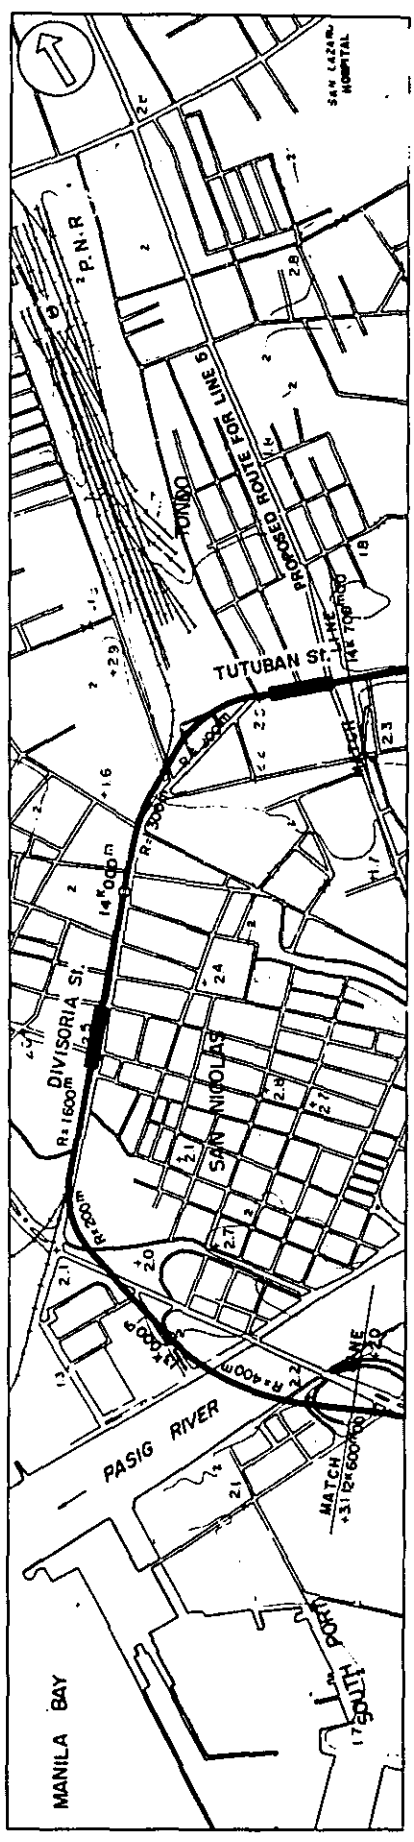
Plan and Profile of Recommended Alternative (4)
